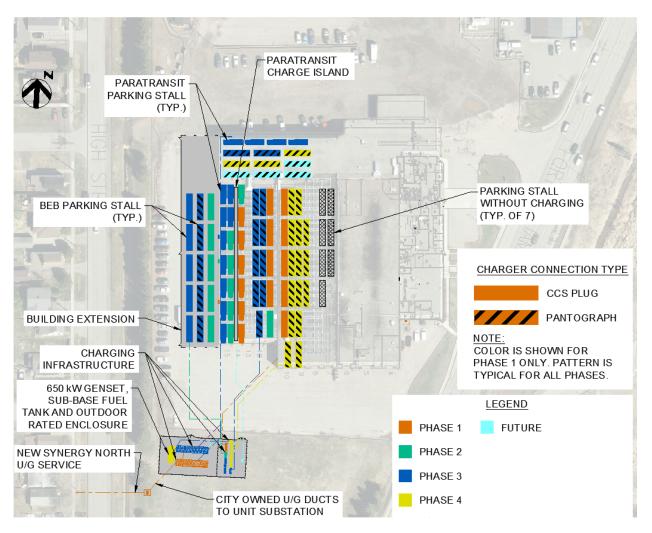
Fort William Road Transit Garage Conceptual Site Layout
